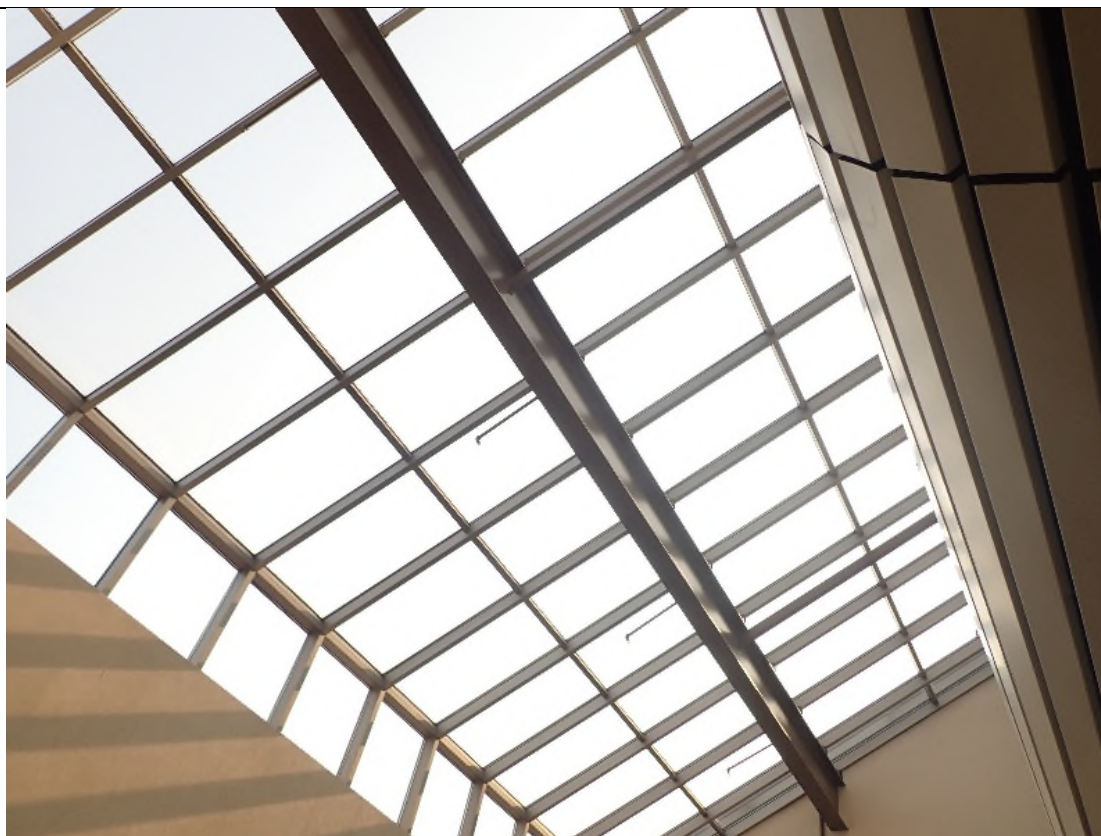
The existing sloped glazing was observed to be bearing on top of the steel beam W610. The sloped glazing transitions to a vertical fenestration system at the exterior of the building.
